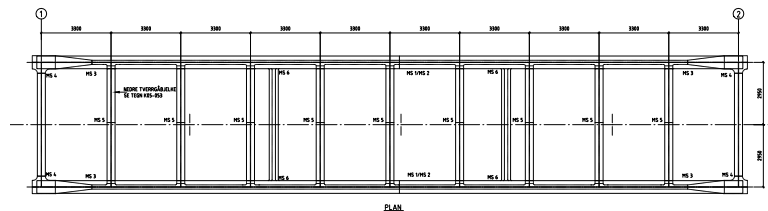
The transversal and longitudinal beams of the bridge studied in this master thesis seen from above.
